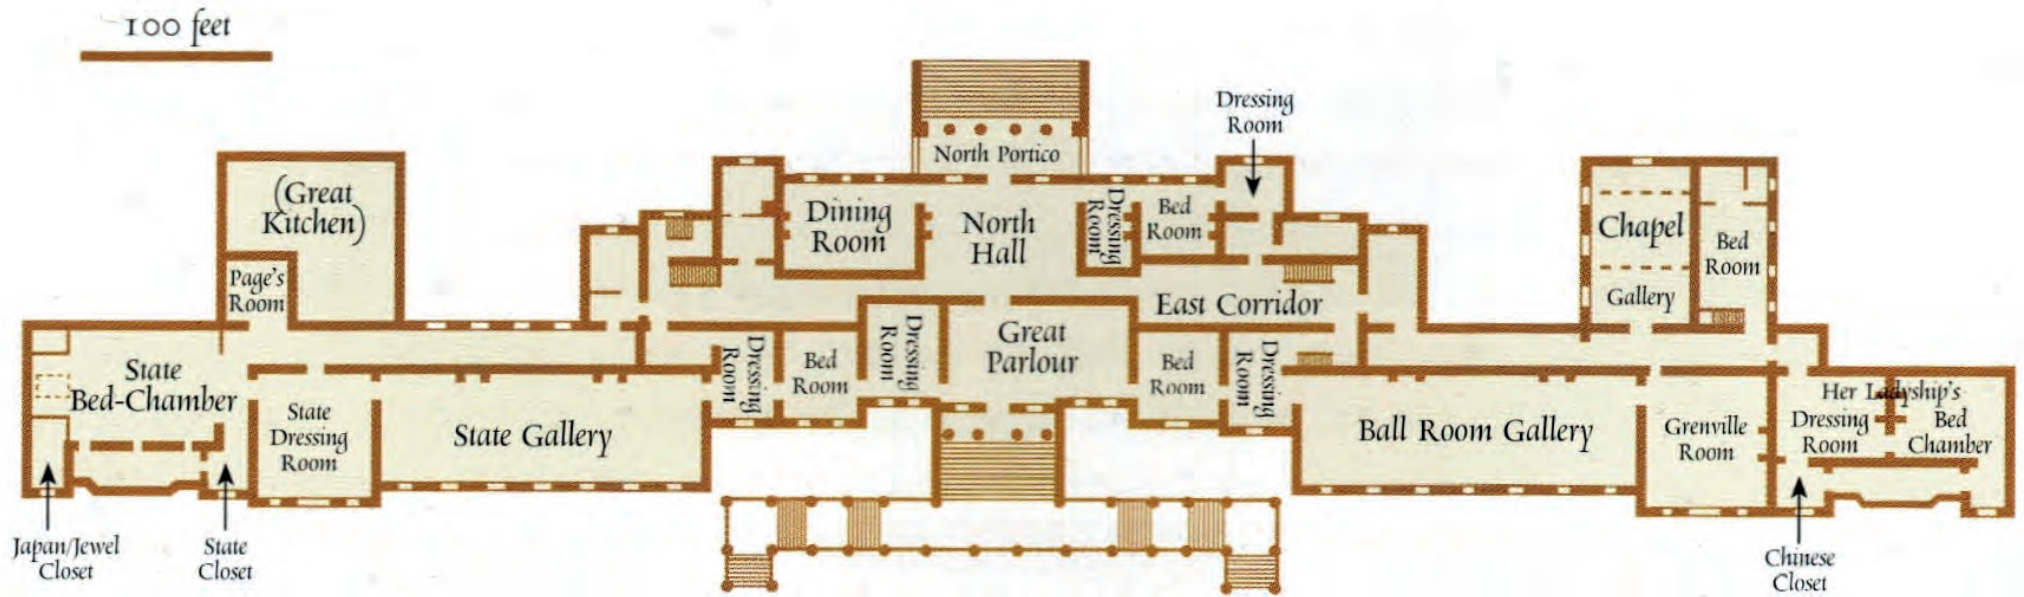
Piano Nobile floor plan of 1759, from Bevington, 2002
